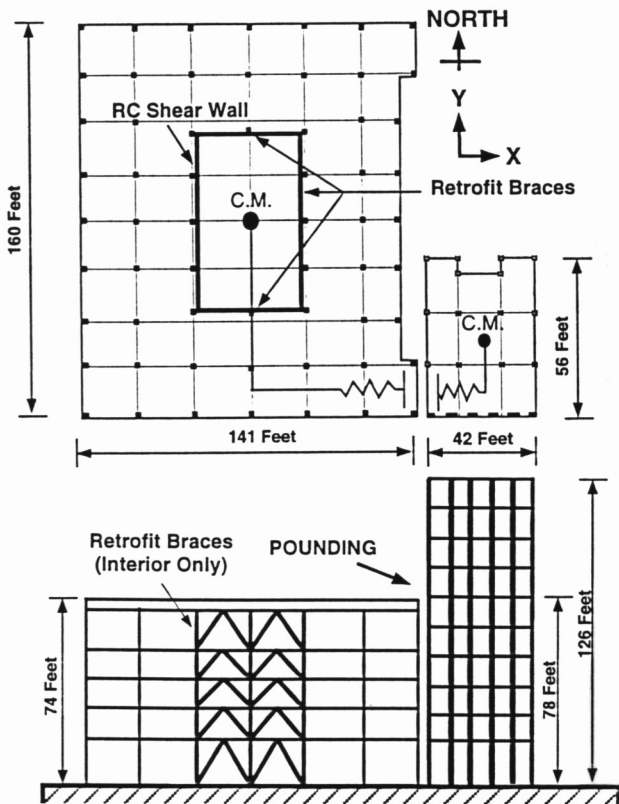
Typical Framing Plans and Elevations of 10 and 5 Story Buildings.
